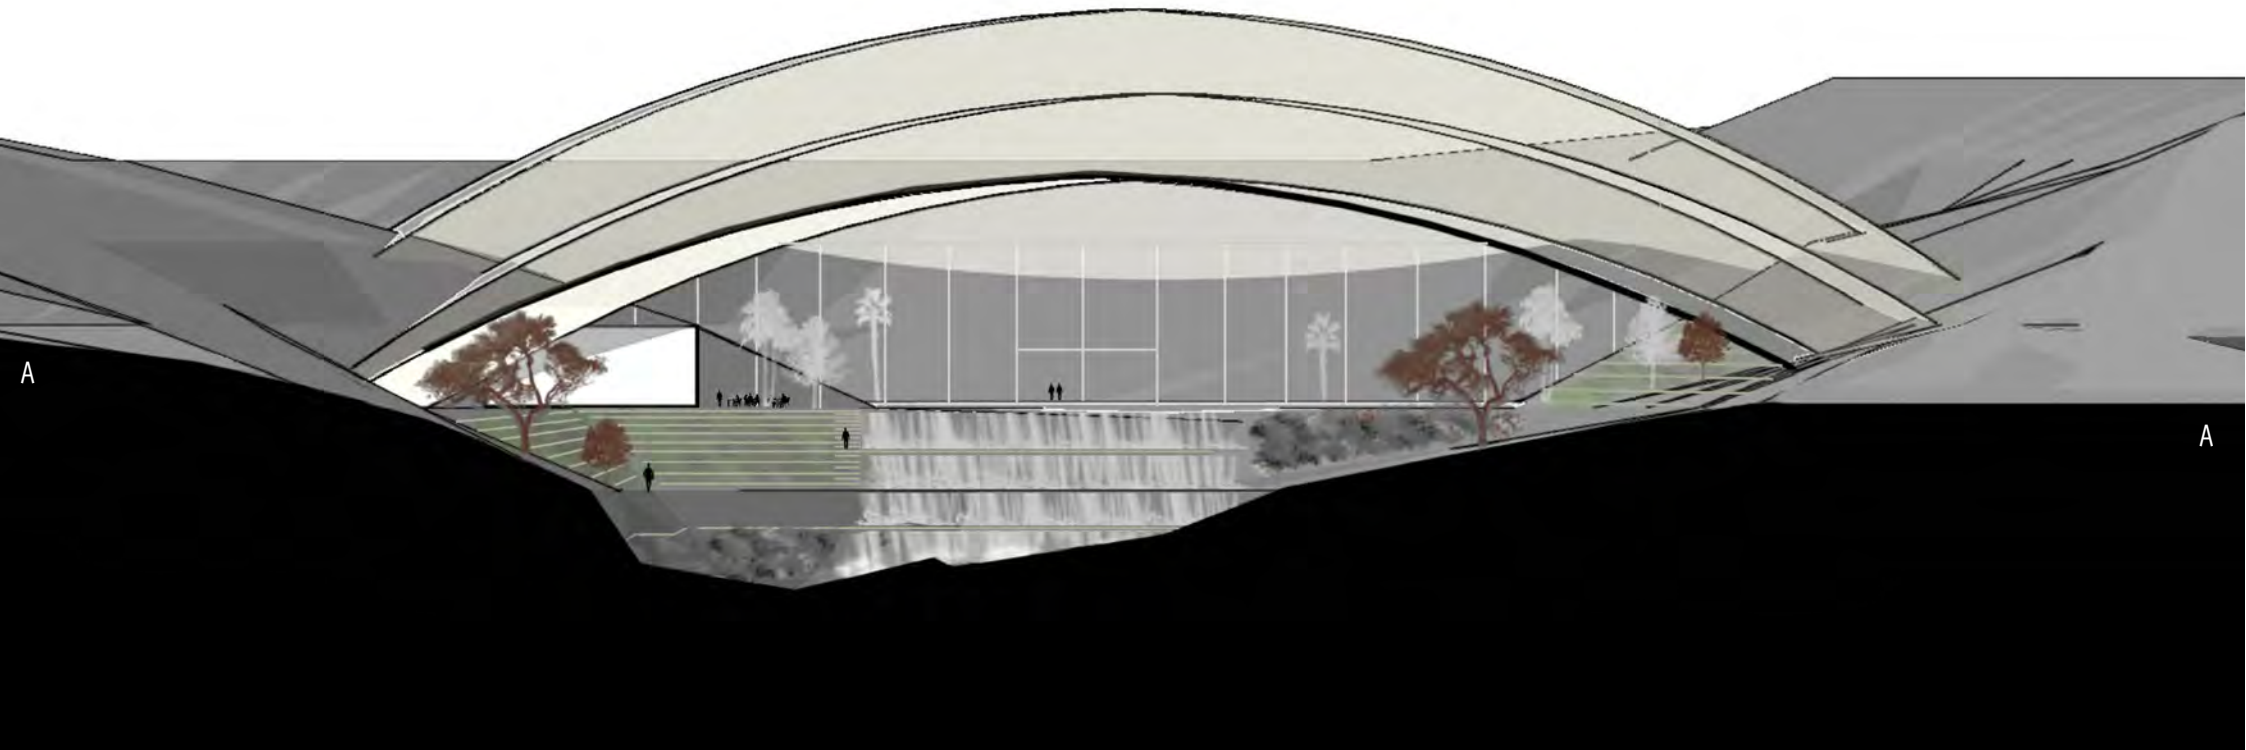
FIGURE: CROSS SECTION/ELEVATION A OF GREENHOUSE
